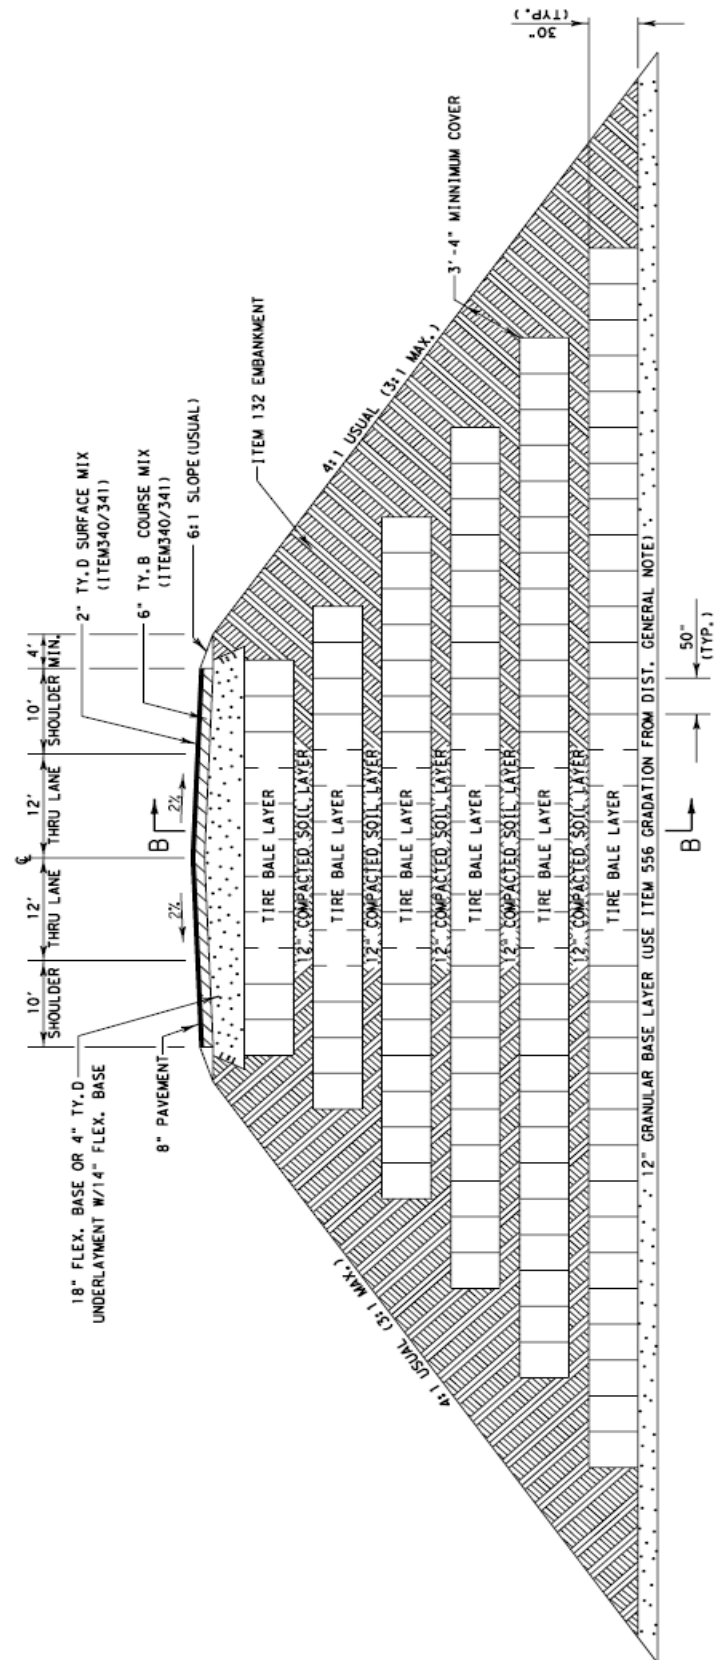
General Cross Section of the Proposed Highway Overpass Provided by TxDOT
